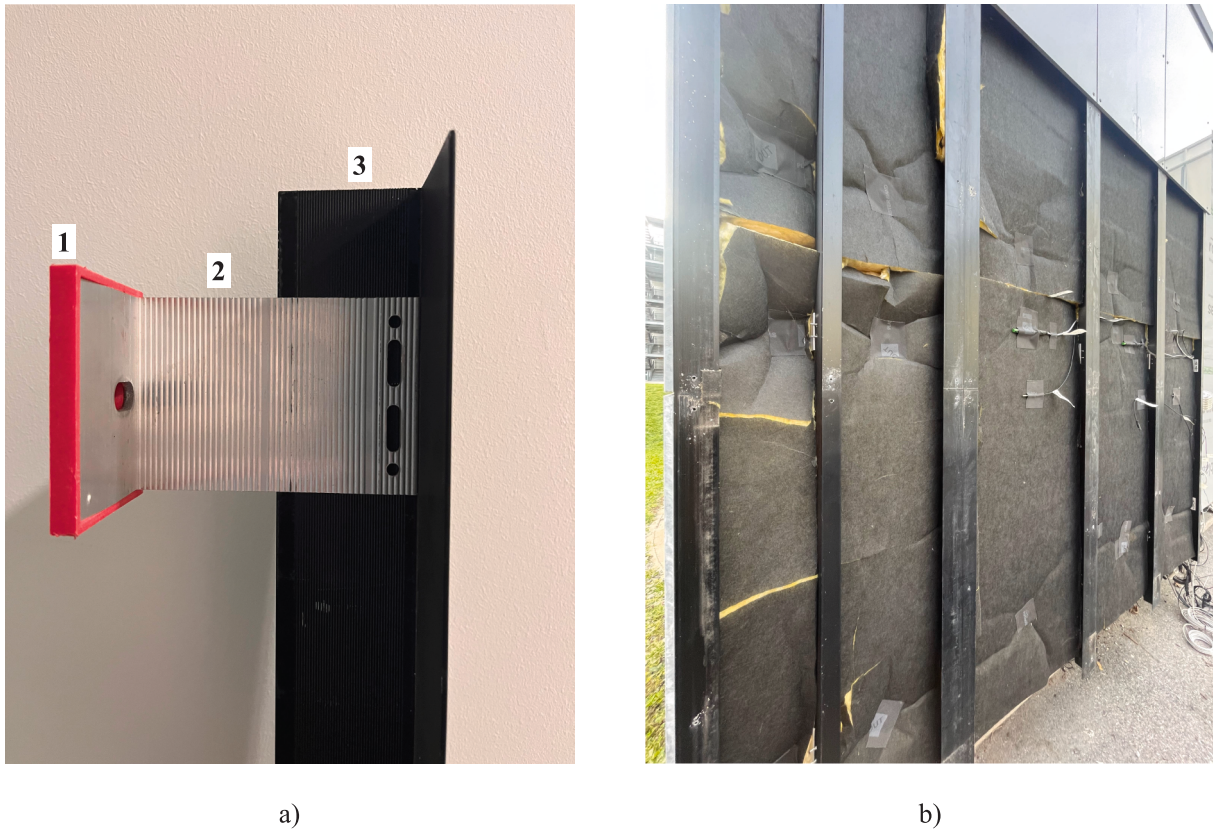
A) ovf mounting system: 1) polypropylene thermal pad, 2) horizontal aluminium bracket (length 120 mm, width 68 mm, height 86 mm), 3) T-shaped rail for vertical installation (height 60 mm, width 120 mm); b) OVF installed on BEE Lab.
